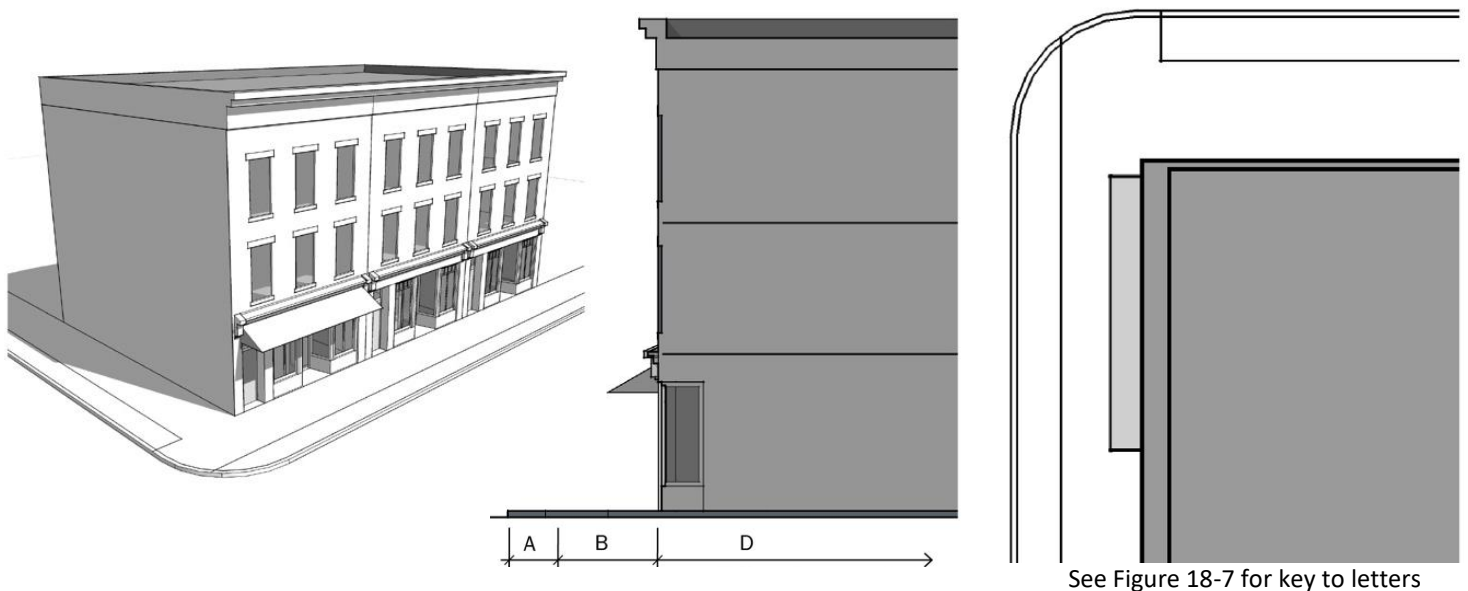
Illustrative View, Section View, and Plan View of Storefront Frontage Type
